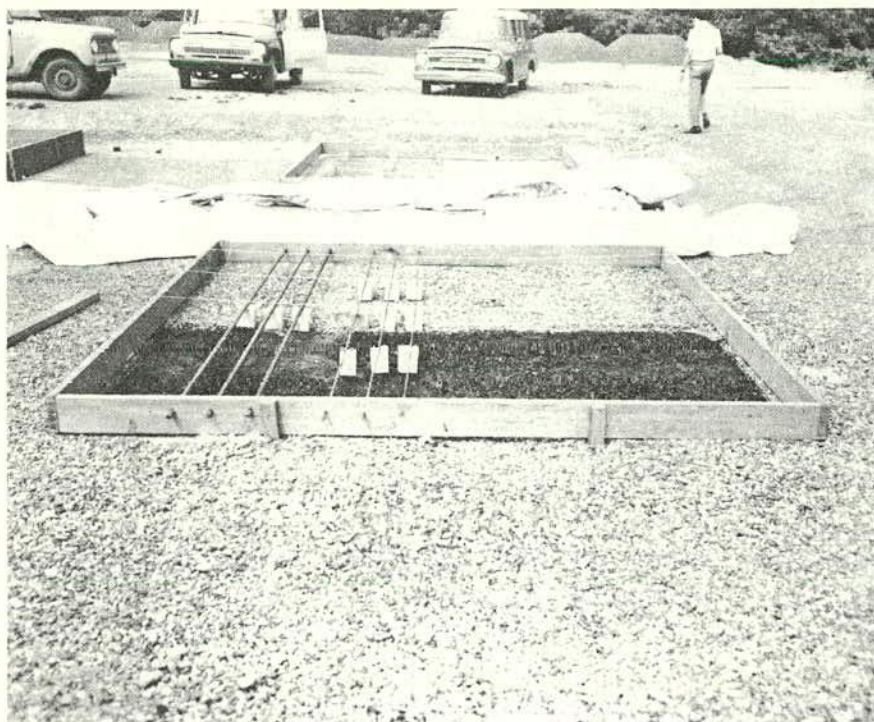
Test Slab A, showing subbase texture, reinforcement and asphalt membrane.
